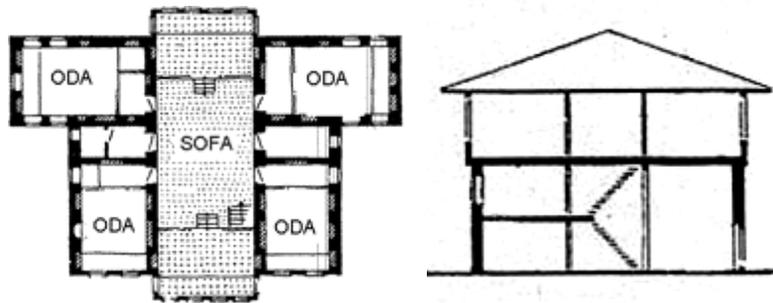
Model Turkish House, plan (left) and section (right). (Eldem, 1954, p. 12)
